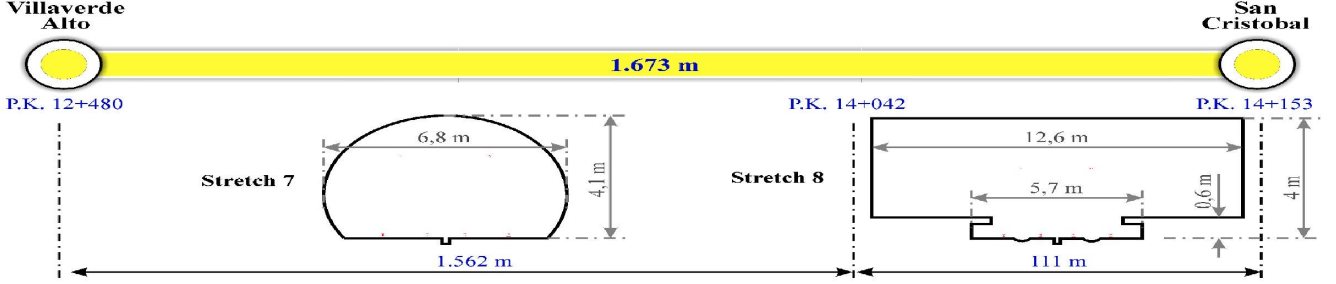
(b): new tunnel cross-sections (Villaverde Alto – San Cristóbal)
